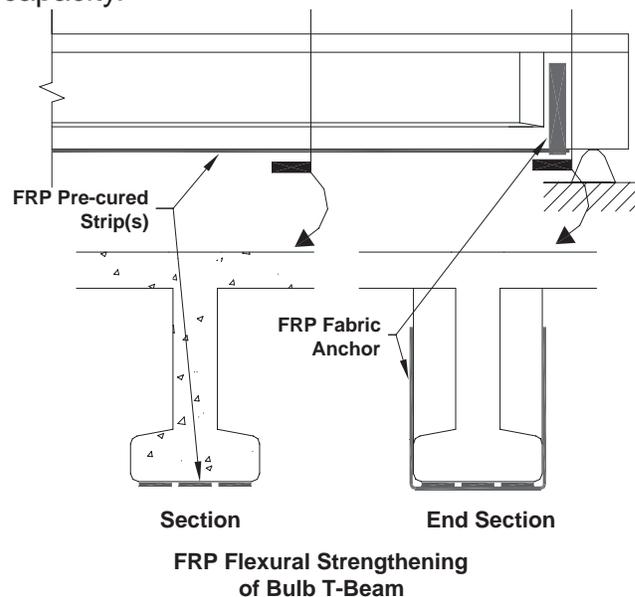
Typical flexural strengthening of AASHTO-type girder bridge
